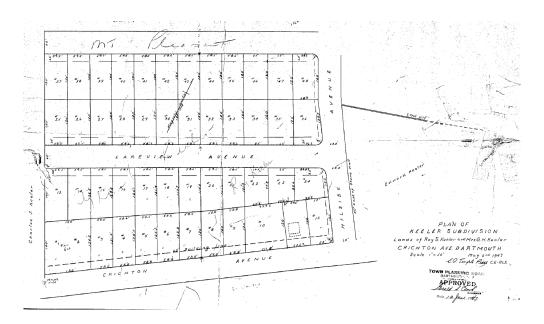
Plan of Keeler Subdivision dated 1947 by Joseph Piers
